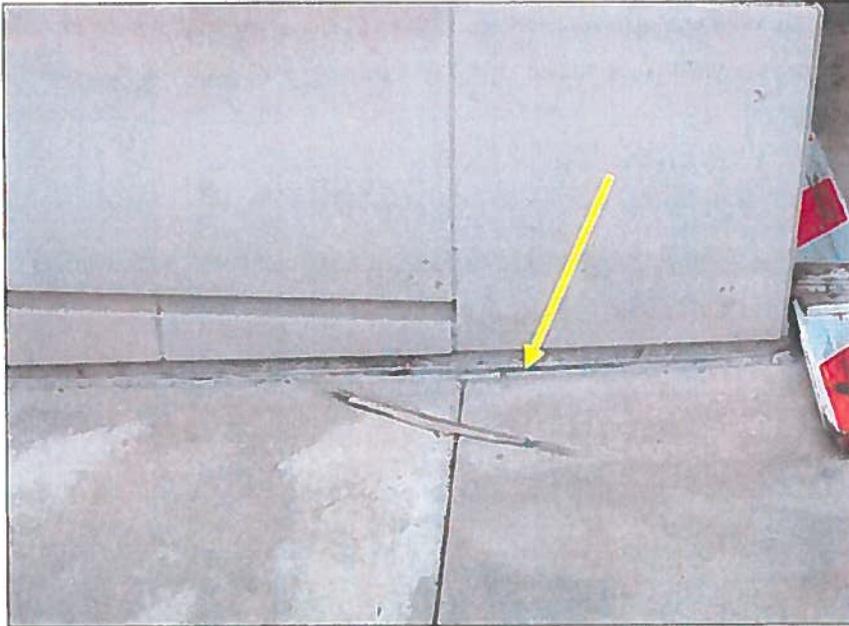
Deteriorated sealant joint at sidewalk / building interface.
